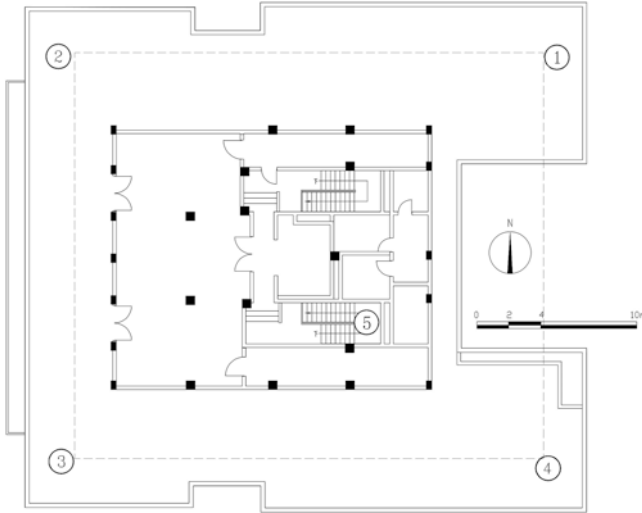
Test points before construction of the roof garden. Test point 1 was located at the northeast of the roof garden, test point 2 was located at the northwest of the roof garden, test point 3 was located at the southwest of the roof garden, test point 4 was located at the southeast of the roof garden, and test point 5 was located indoors on the 12th floor of the building
